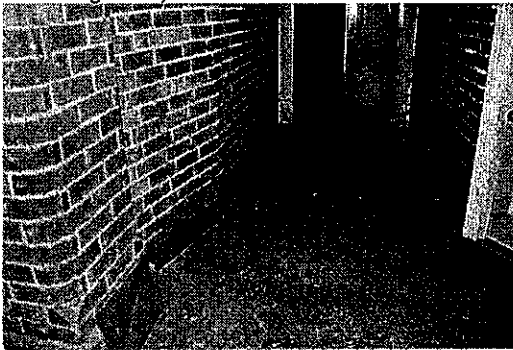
Interior, Exchange Hall (space H01). Detail of northern passage to call room showing evidence of rising damp on the lower courses of the brick walls.
